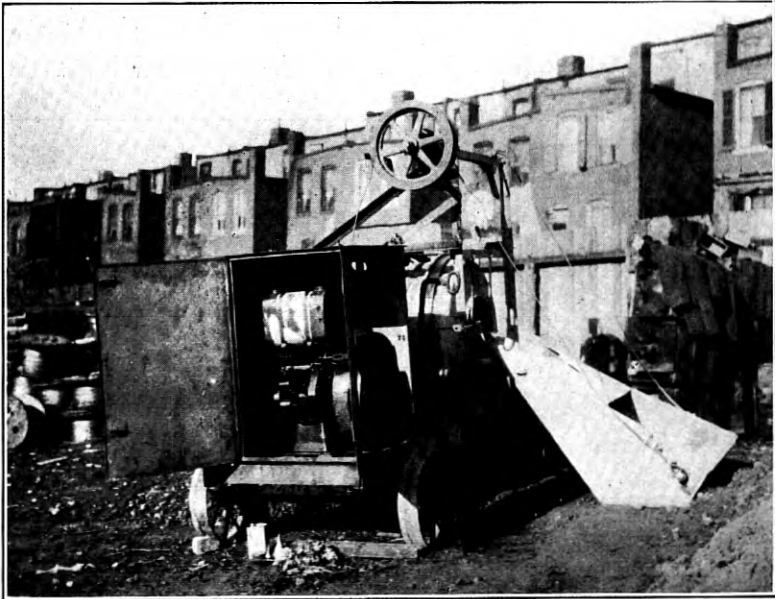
Concrete Mixer Adapted to Meet Telephone Construction Requirement
